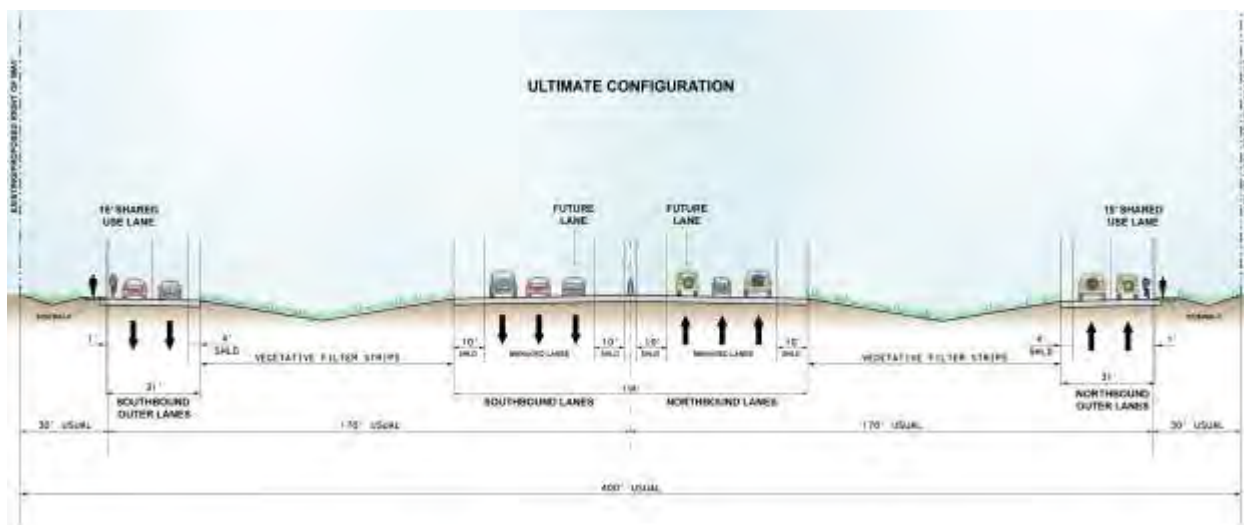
Preferred Expressway Alternative typical section south of Stone Oak Parkway
